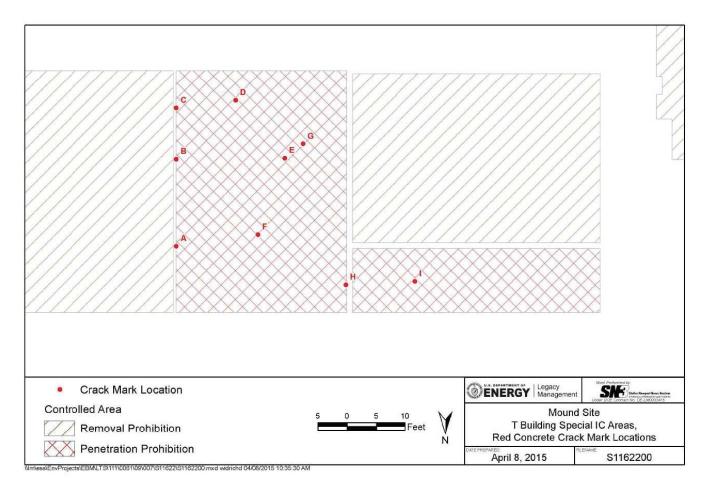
Mound Site, T Building Special IC Areas, Red Concrete Crack Mark Locations
